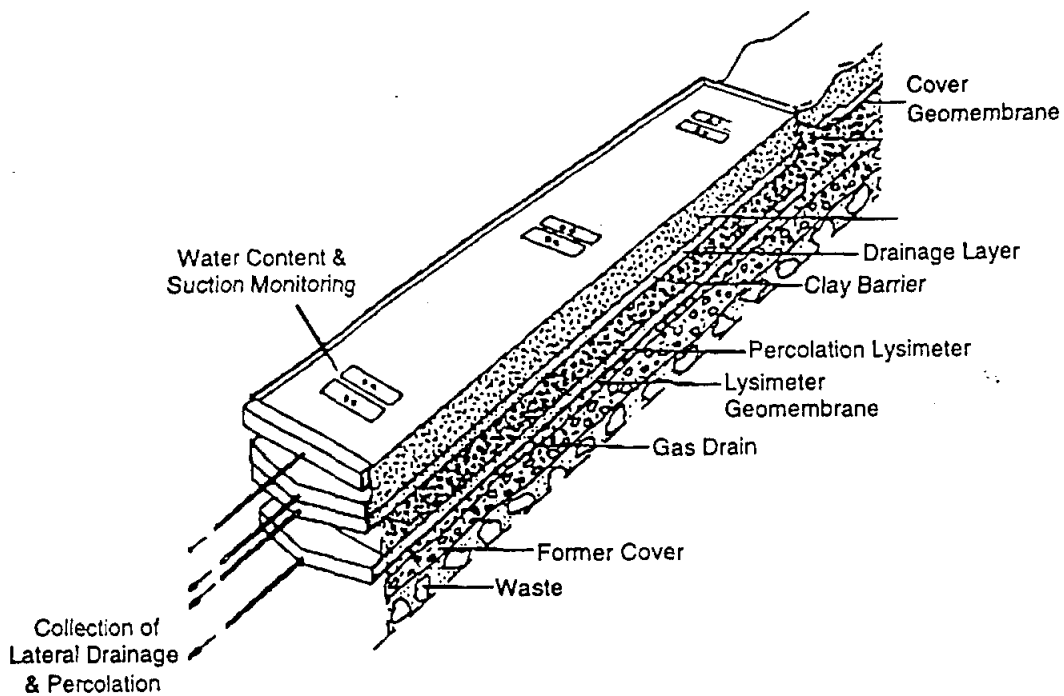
Schematic of Test Section Used in Georgswerder Landfill Cover Study (adapted from Melchior and Miehlich 1989).
